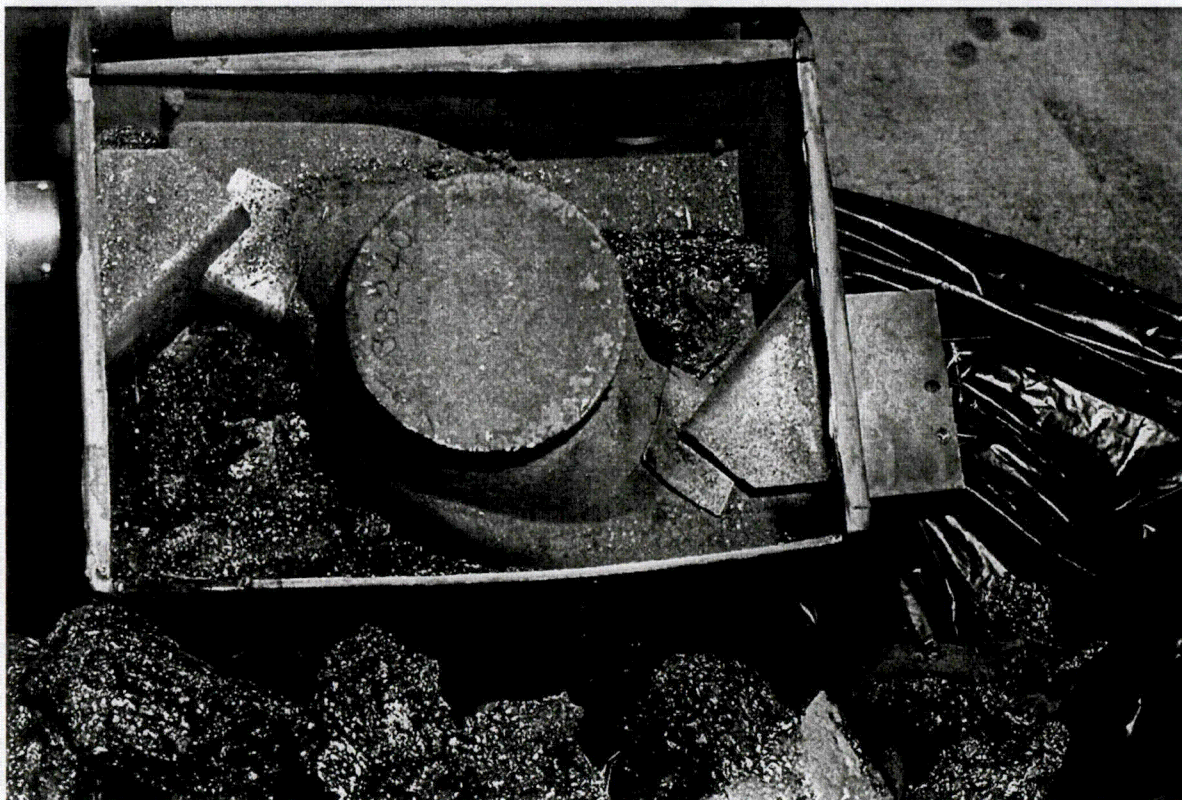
CTU-2 Post-Test Disassembly; Interior Cavity w/ Foam Char Removed
